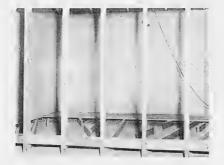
Arrangement of air ducts in the floor of the jacketed cold-storage room.
